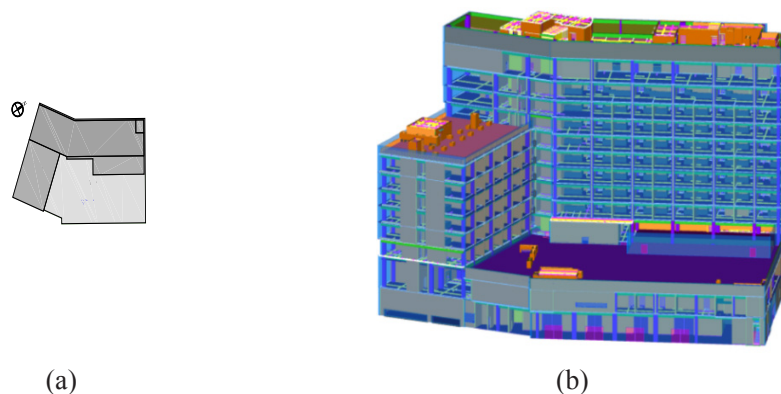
Hotel layout plan:(aplan view, and (b) three-dimensional view.
